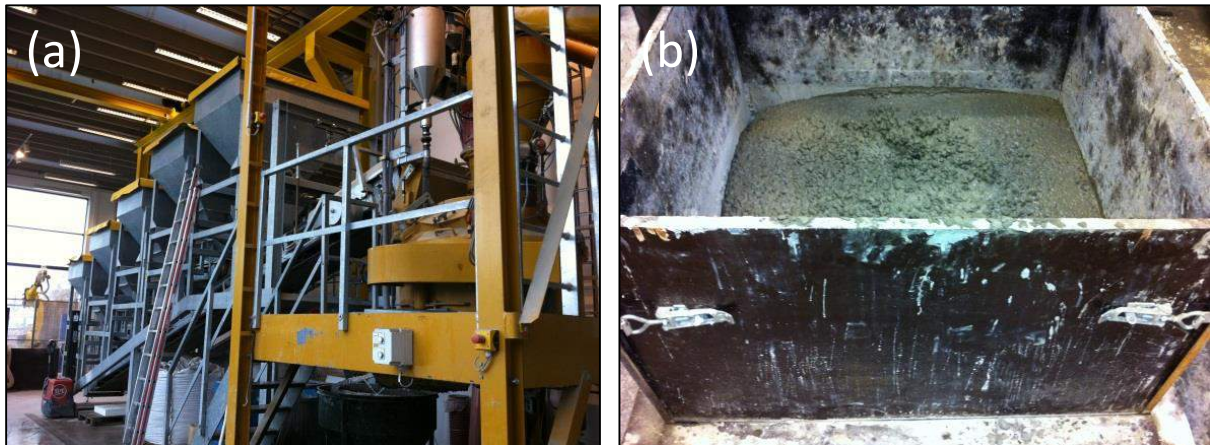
(a) Full-automatic mixing station used for mixing of the concrete. (b) Fresly mixed concrete.
